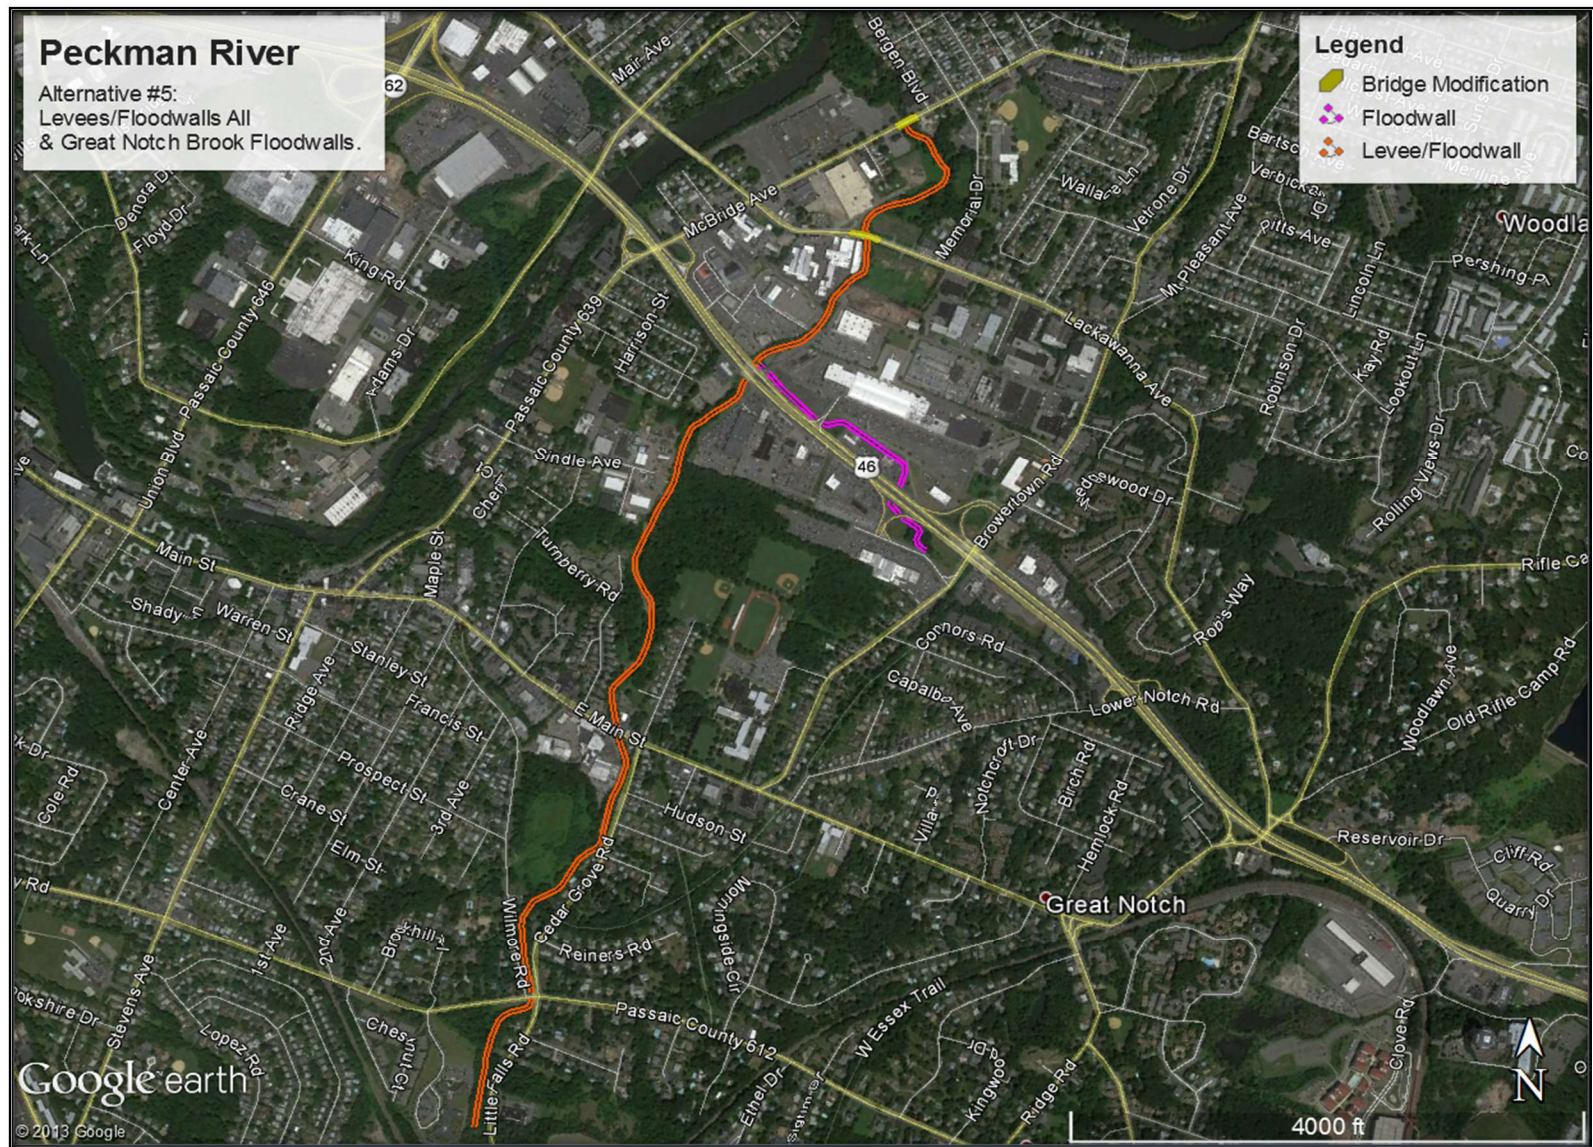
Alternative #5 – Levee/Floodwall Upstream and Downstream of Rt. 46 & Great Notch Brook Floodwalls.
